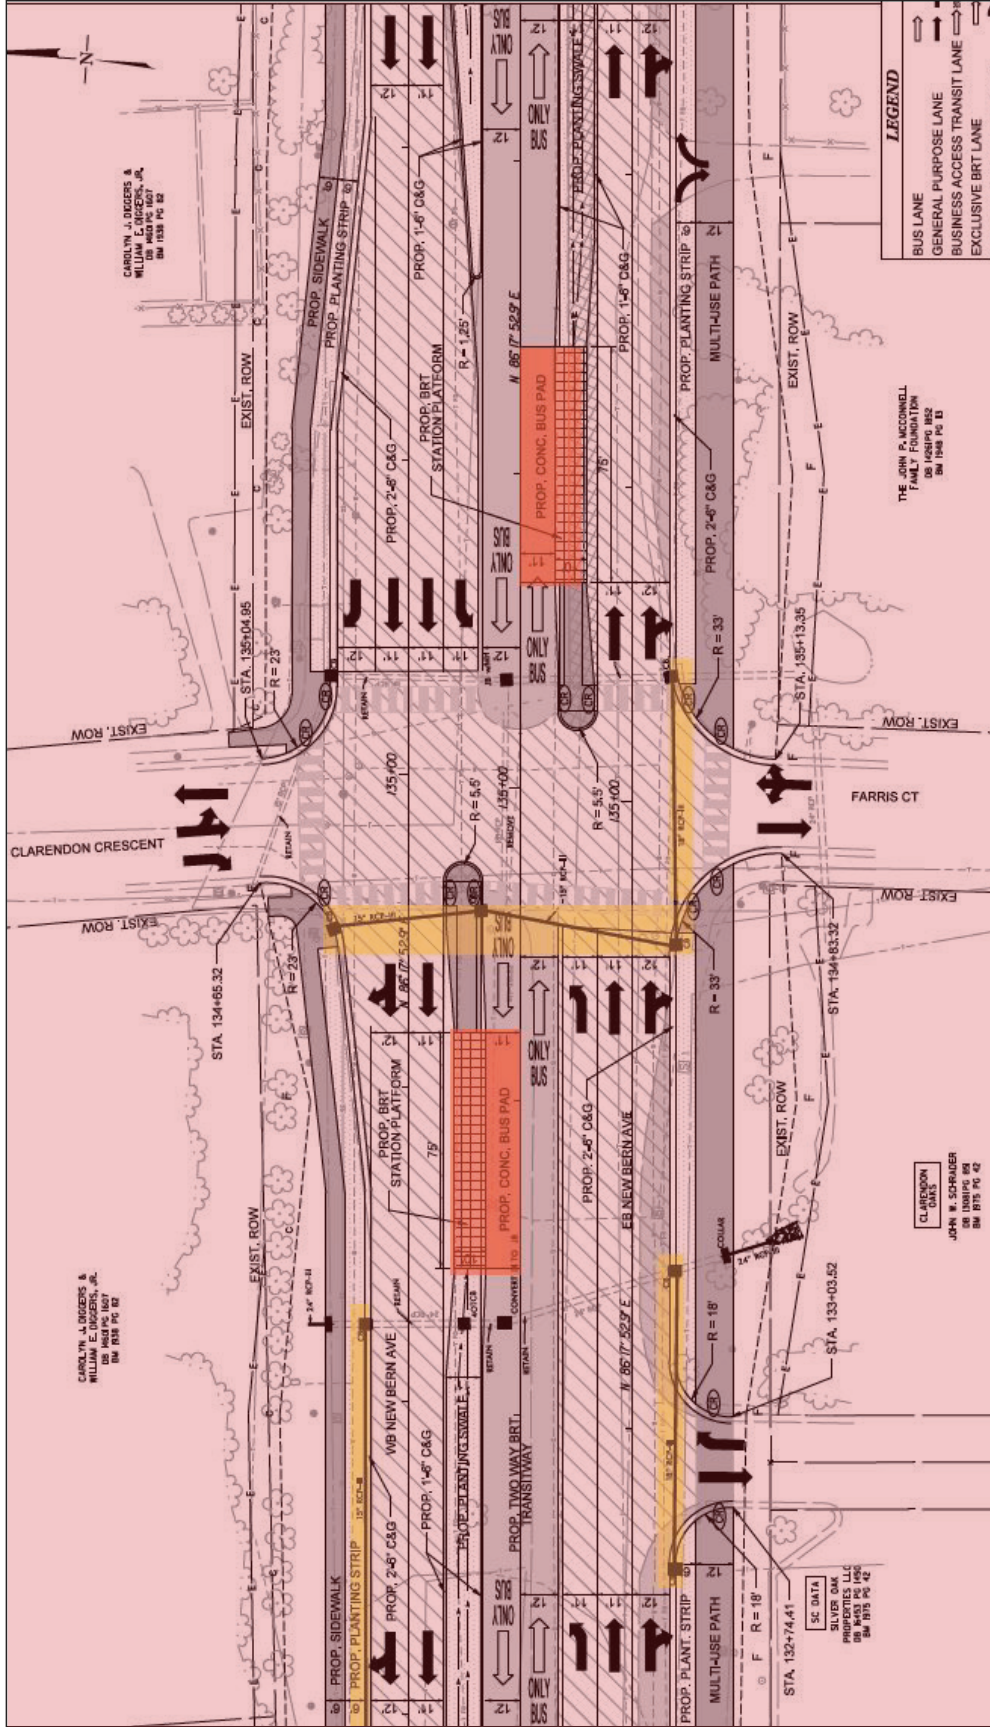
Longview Gardens Historic District (red) and the Clarendon Crescent/ New Bern Avenue and Farris Court/New Bern Avenue Stops, Wake BRT New Bern Corridor Preliminary Plans, Sheet R-NBN-029, 2020
